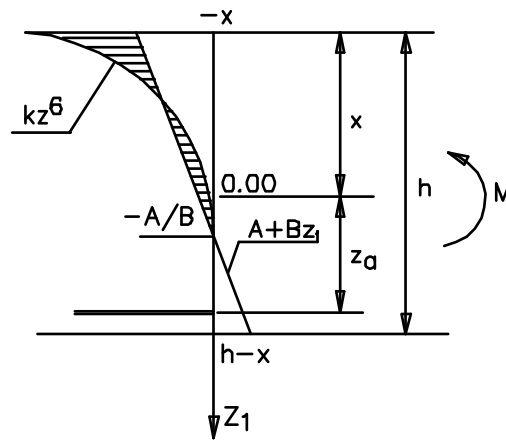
Self-stresses in reinforced concrete beam with crack.
